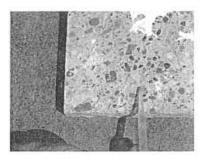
Place a drop of clean drinking or distilled water on the pavement surface.
